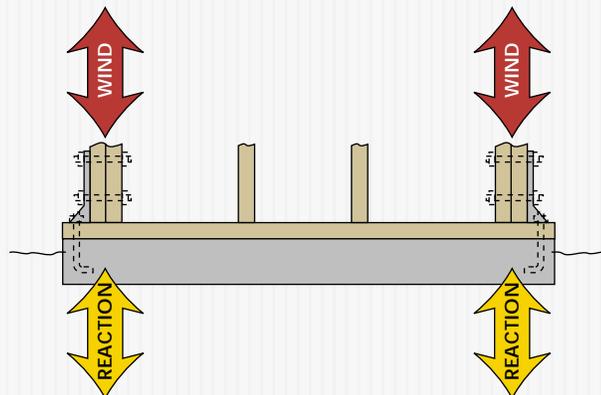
Holddown anchors - transfer overturning forces into foundation
